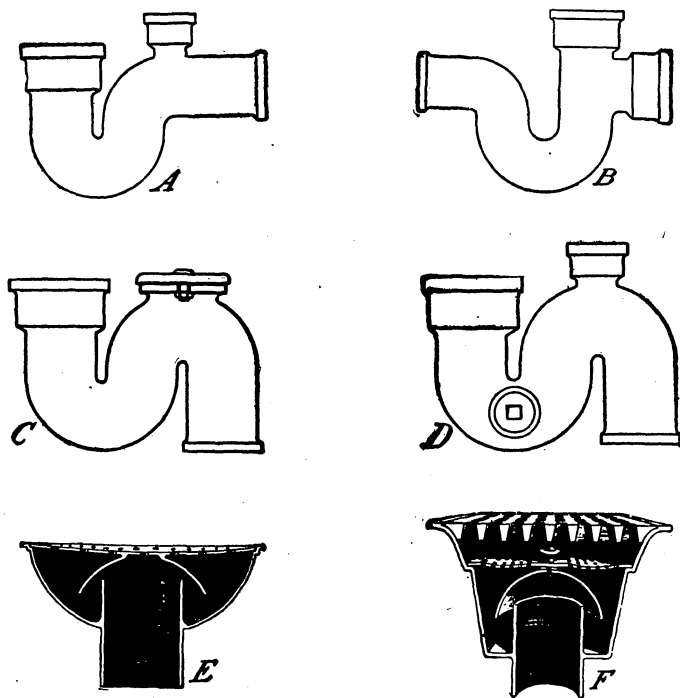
Types of traps for drainage in abattoirs. A, "P" trap with vent; B, running trap with vent; C, "S" trap with hand hole and cover; D, "S" trap with vent and brass trap screw on side; E, section of bell trap; F, section of cesspool bell trap.
